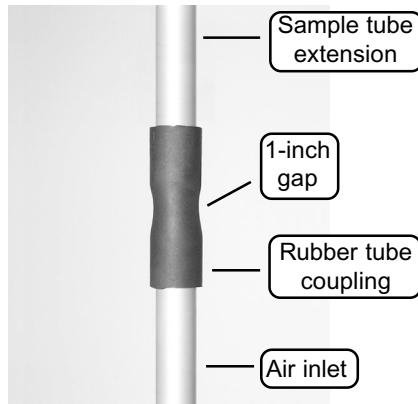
Installation of the tube coupling on the sample tube extension.
